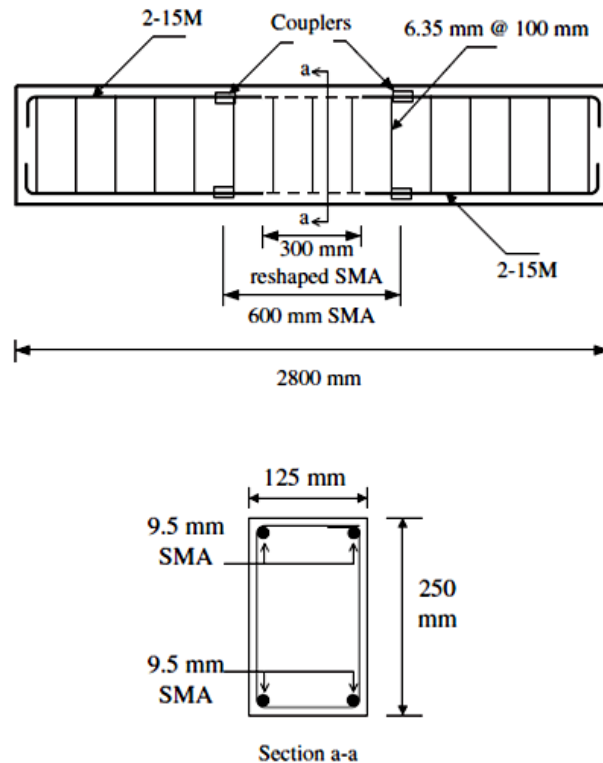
Reinforcement detailing (Abdulridha et al., 2013)
